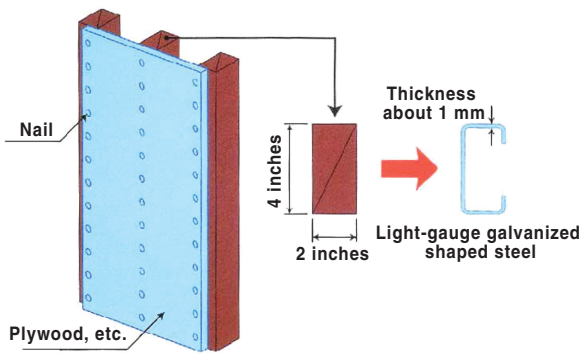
2 x 4 wooden frame and light-gauge steel shapes
